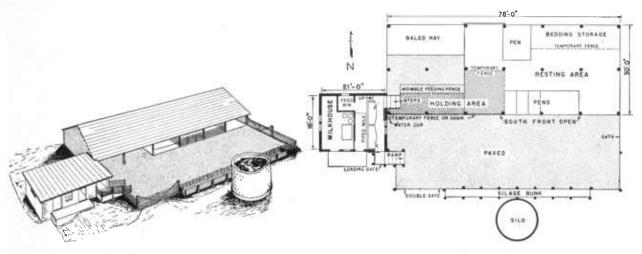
A loose-housing layout adapted for a 20-cow herd. It is also ample for 25 cows if young stock are housed elsewhere.
